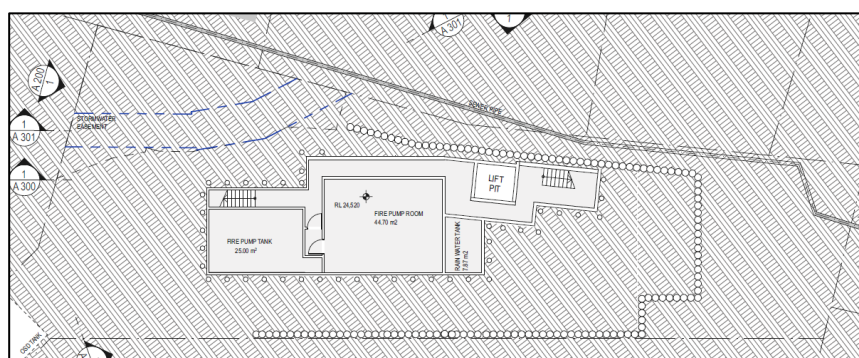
Proposed lower ground floor plan (Source: TonkinZulaikhaGreer)
